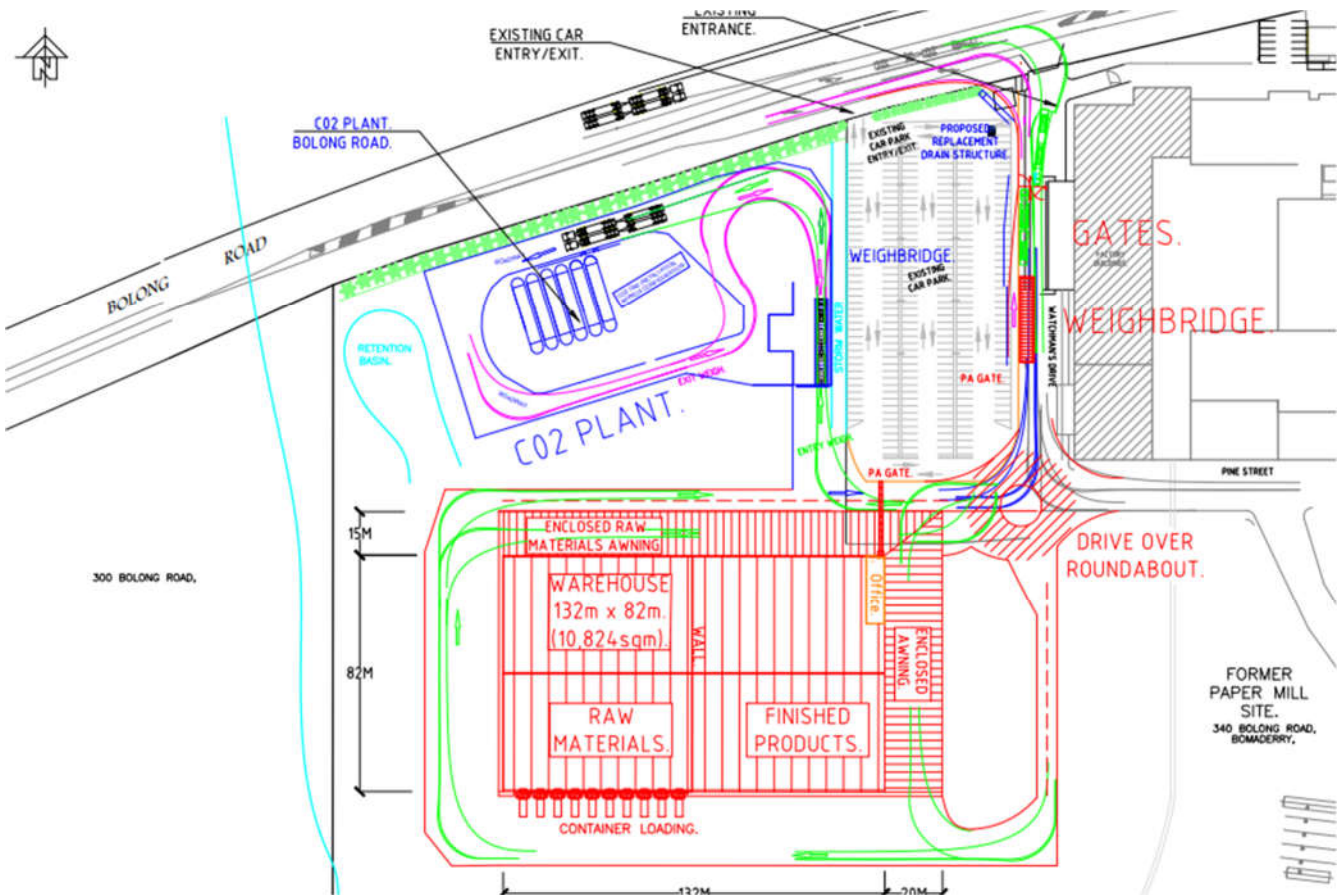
Site Plan of Proposed Warehouse (Source: Manildra Group)
